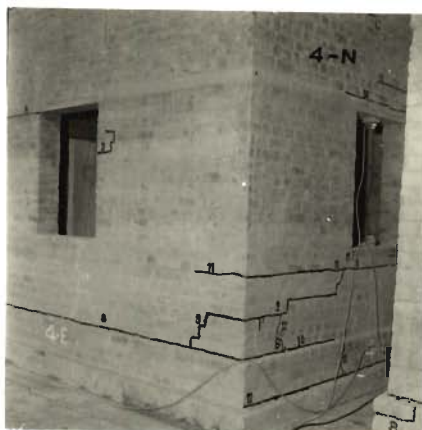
\_ EAST PORTION OF BOTTOM SPANDREL OF NORTH WALL DEVELOPED MORE CRACKS (MODEL 4)
